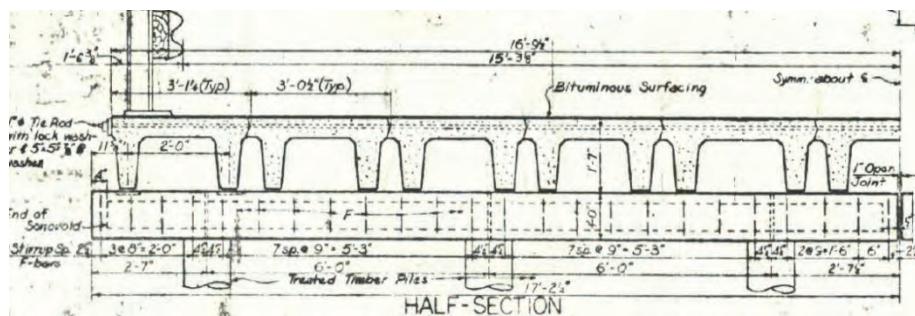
Typical Half Cross Section of Wide-Leg Channel Bridges (SCDOT)
